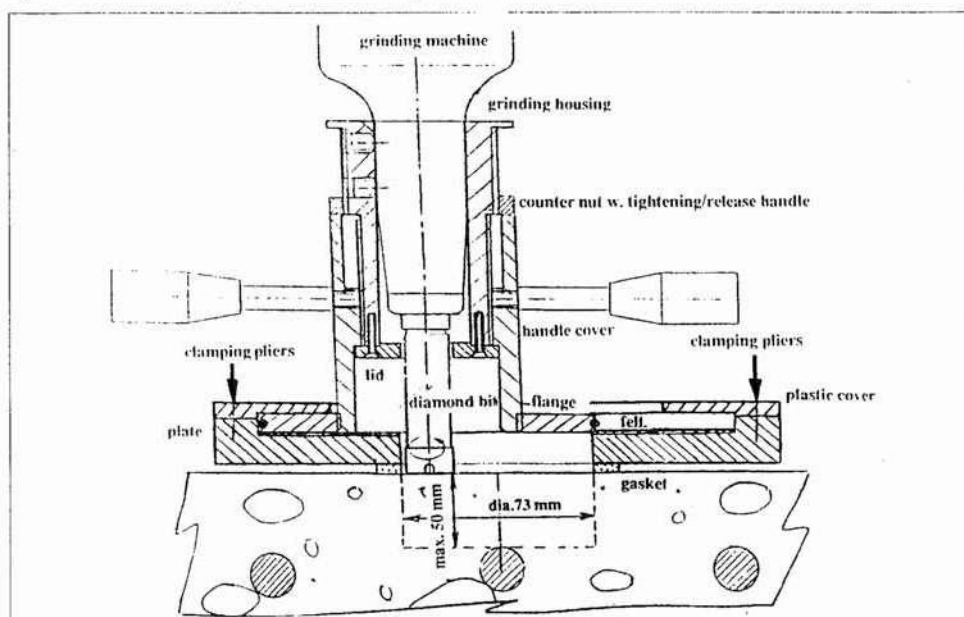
The PF-1100 Profile Grinder, Mark II, used in-situ for grinding out of dust on a horizontal surface.
